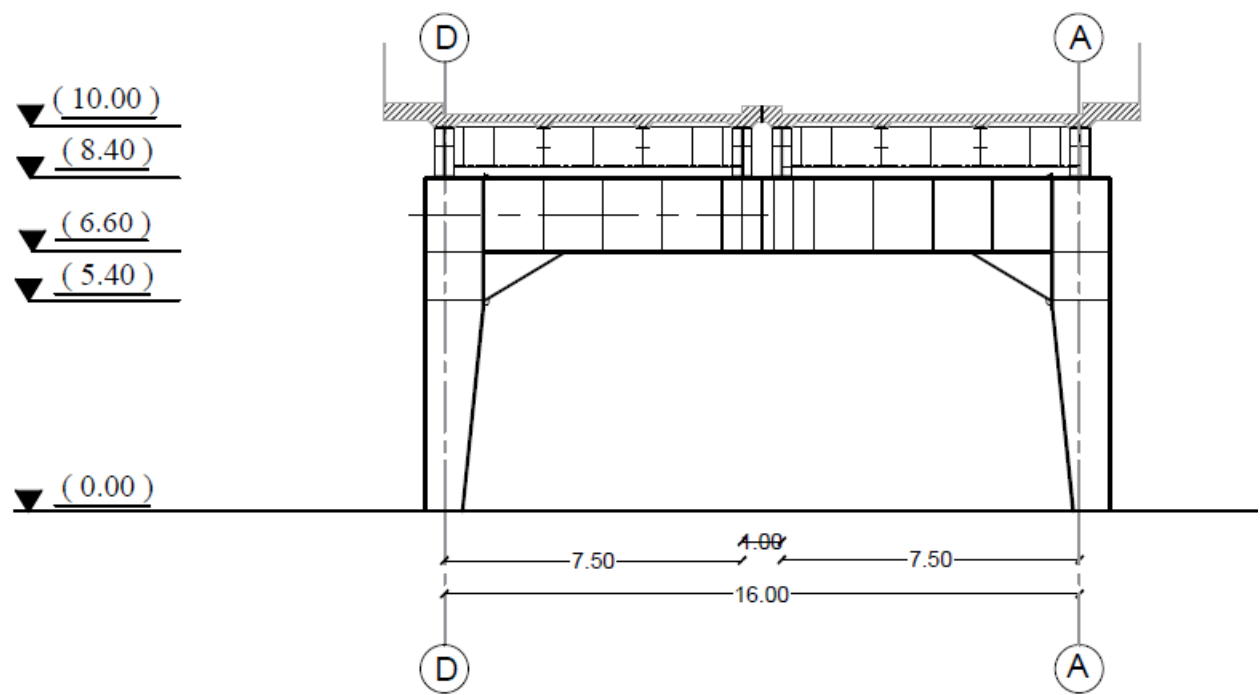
4 Layout of deck part plan, side view & elevation (first trial)
